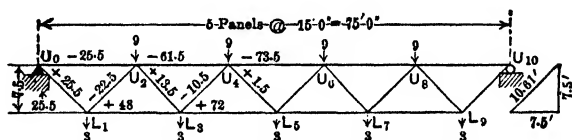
Dead panel loads and index stresses. Single-track deck Warren truss railroad bridge.
